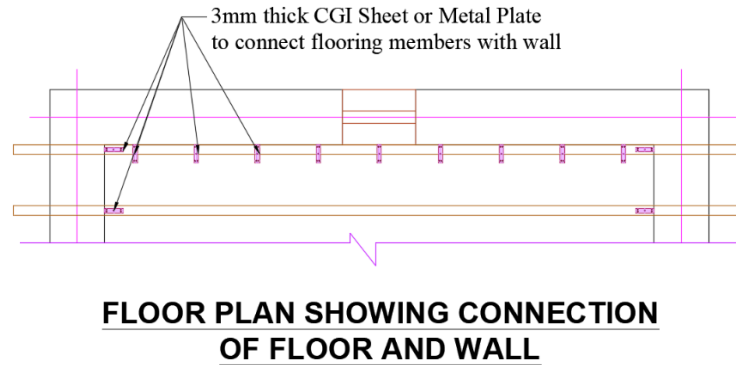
Drawing showing installation of Keys to connect floor and wall which is parallel to joists
